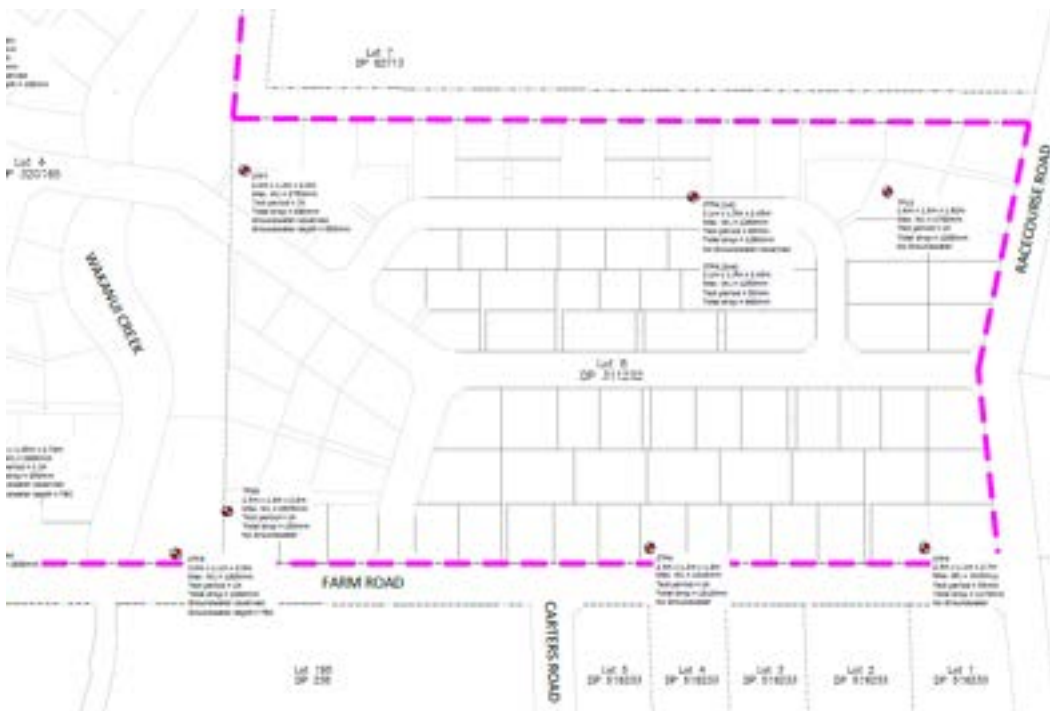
Infiltration Test Pit Location Plan (Eastern Part)
